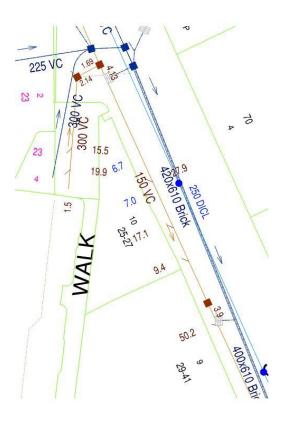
Existing Sewer – 150VC (indicated in brown line)
